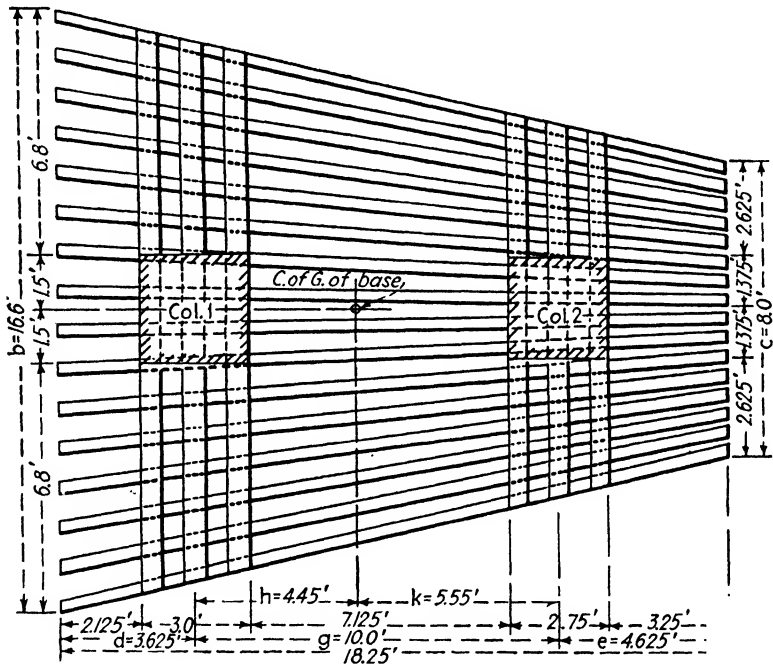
Steel I-beam Grillage for Two Columns Supporting Unequal Loads. The Load on Column 1 is 500,000 Lb.; That on Column 2 is 400,000 Lb.
